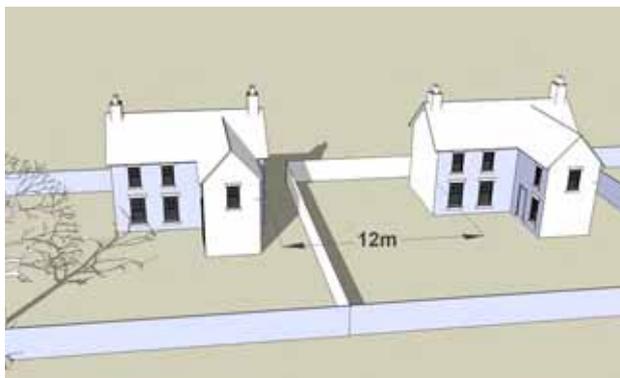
12m should be allowed between an existing elevation with a primary window and any blank gable or wall to any new building or extension. The same distance applies to new elevations containing primary windows facing existing blank elevations.
